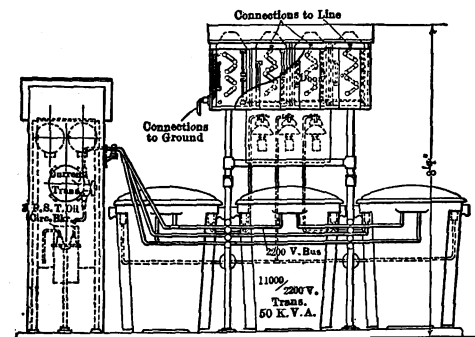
Switchgear Arrangement for 110,000-volt, 150-kv-a. Outdoor Transformer Station
